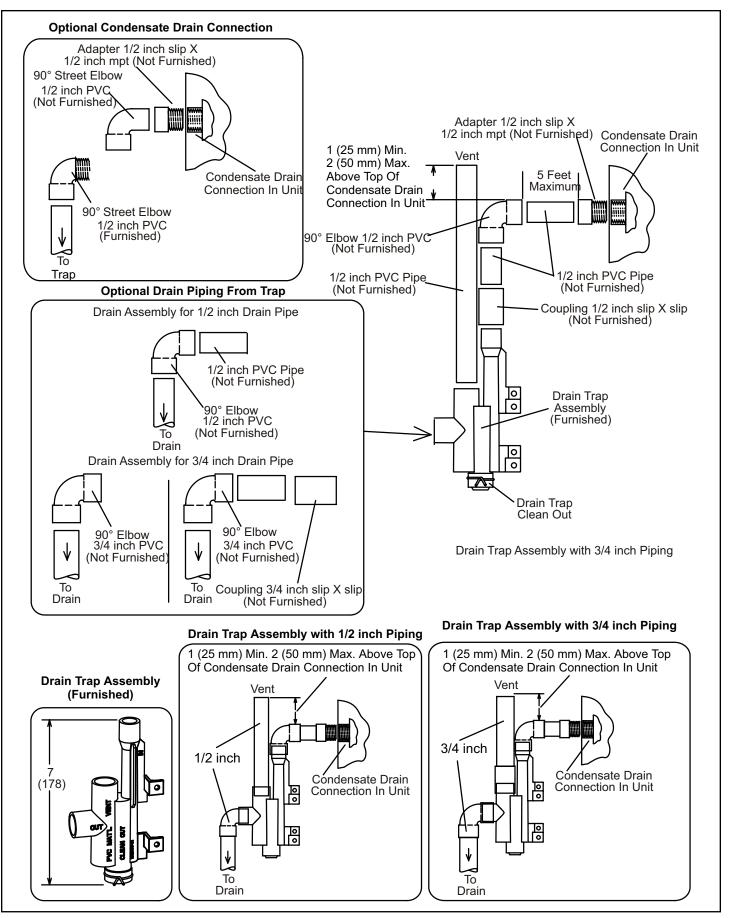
Trap / Drain Assembly Using 1/2" PVC or 3/4" PVC Cold End Header Box with 1/2 Drain Connection
